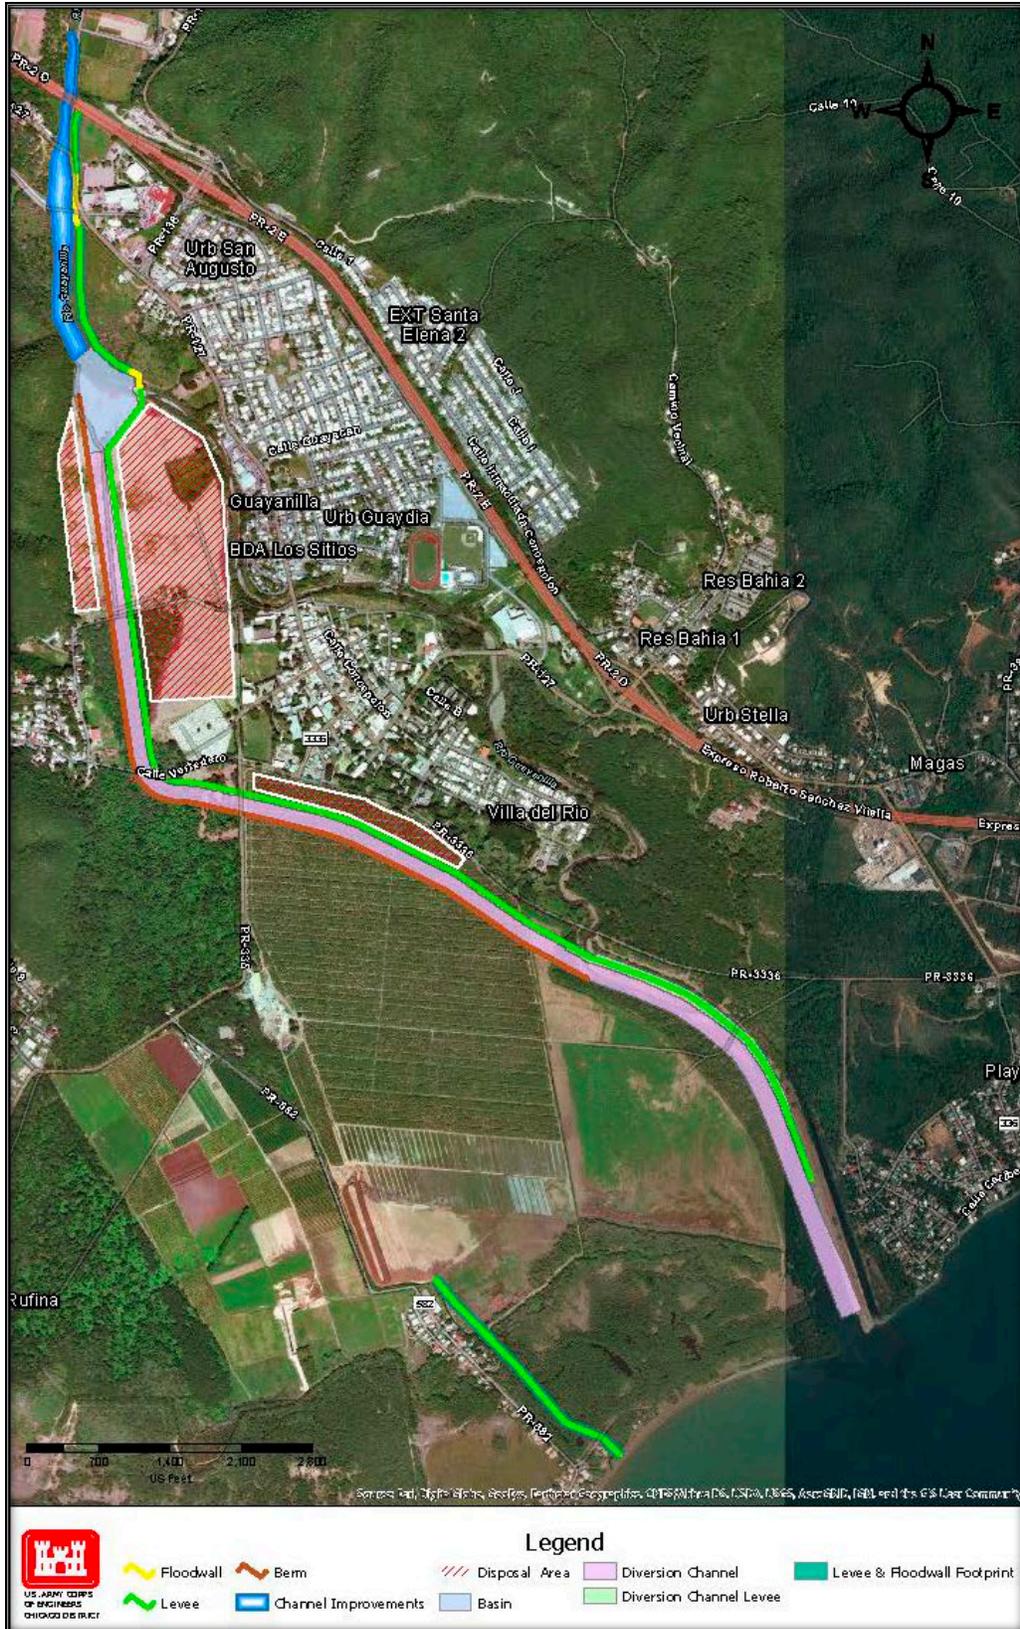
Alt#3 Diversion Channel South w/ Single Line Protection - Detailed
